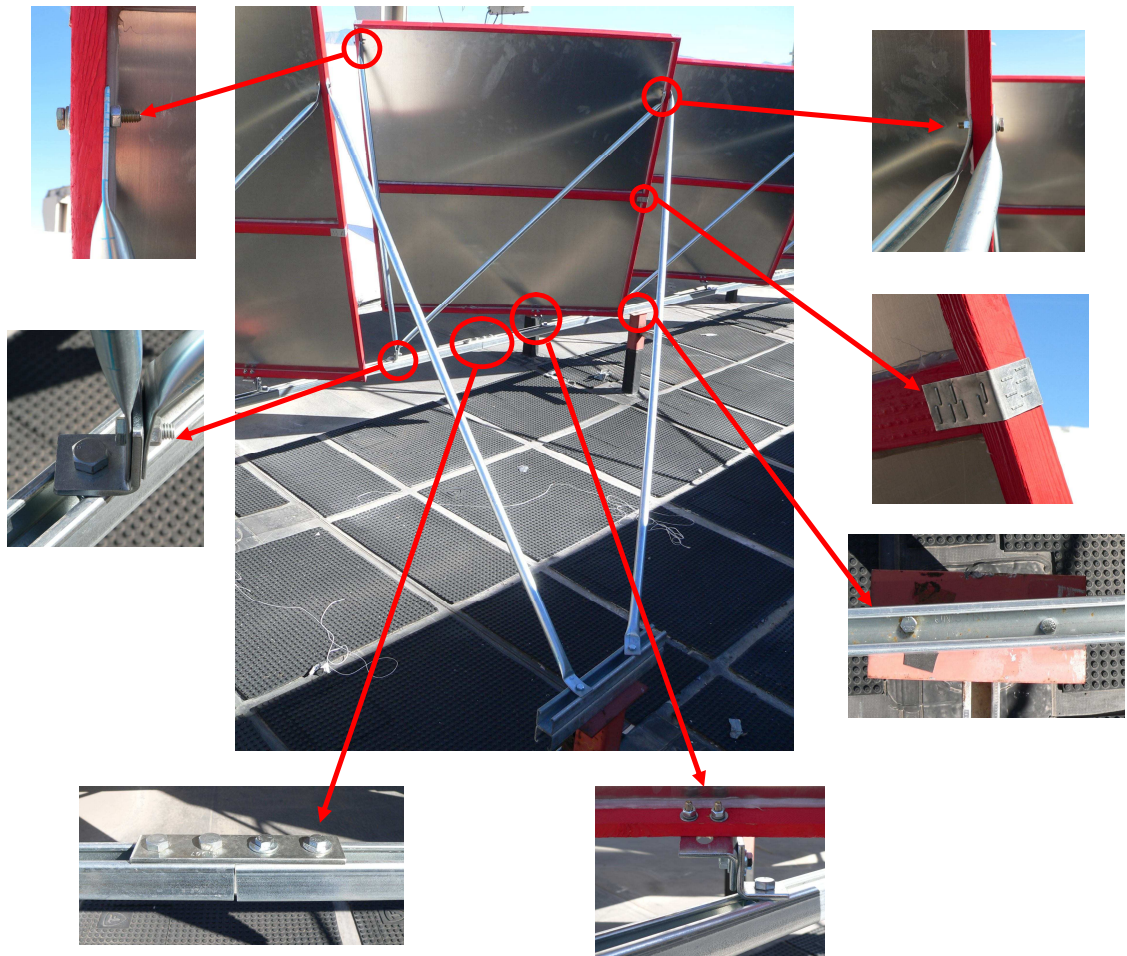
Installation of Mirror to Base Frame and Base Frame Assembly
